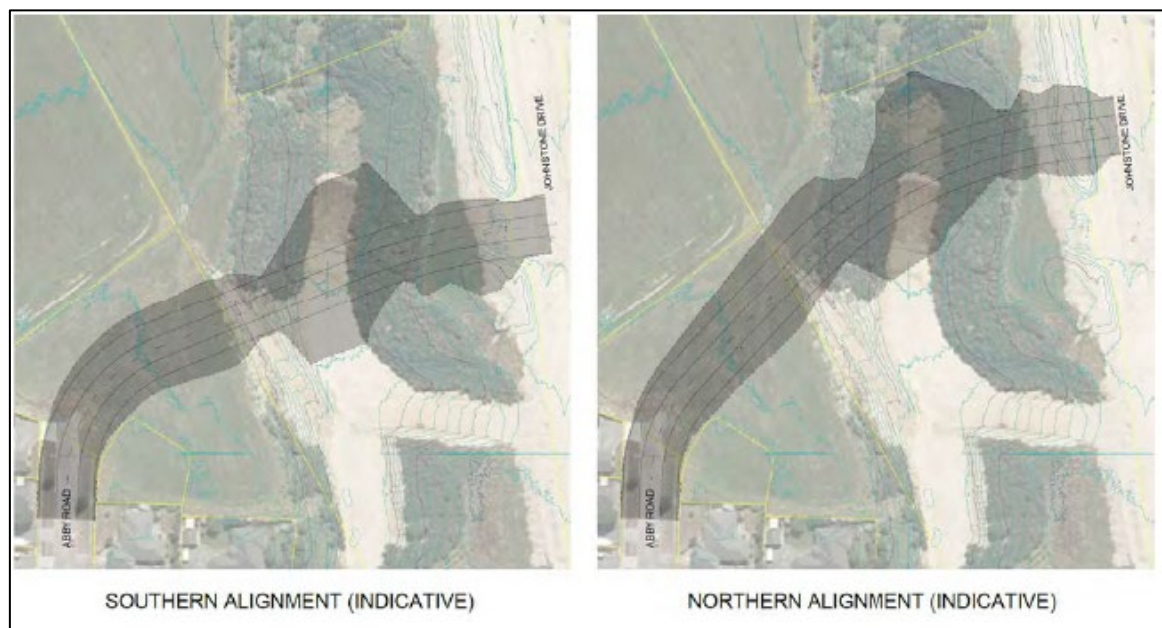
Sub-Options (Southern and Northern Alignment) for connecting Abby Road to Johnstone Drive
